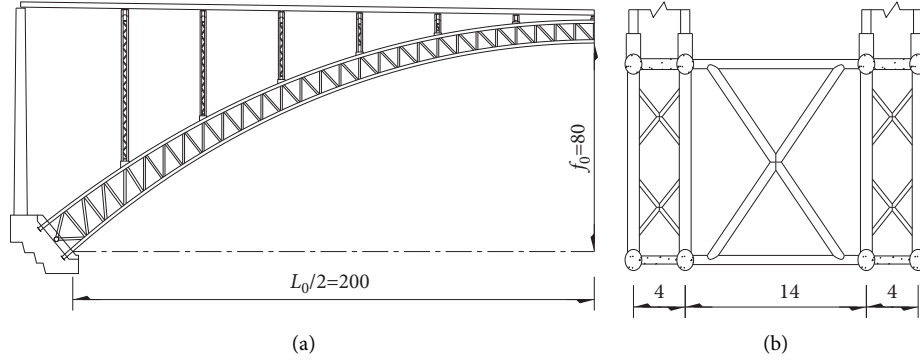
Main bridge structure layout (unit: m). (a) Half main bridge facade. (b) Typical cross-section of main arch ring.
